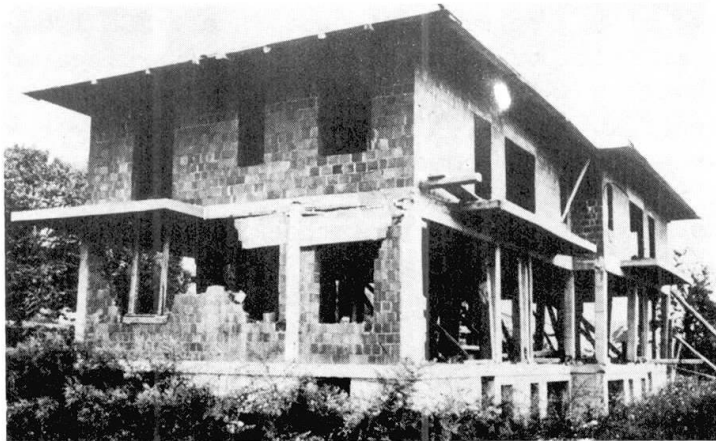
(after September 15th): Uncompleted building in Gemona after renewed earthquake stress. The reinforced concrete columns in the groundfloor were completely destroyed at their fixing points, connection being maintained by the reinforcement only. The massive wooden struts in the groundfloor saved the building from collapse during the second strong earthquake. The already damaged brick wall in the groundfloor was additionally strained due to the strenghtening effect of the wooden struts in the open groundfloor area. The wide brick window jamb was broken out and the reinforced concrete window supports shaken from their rests.
